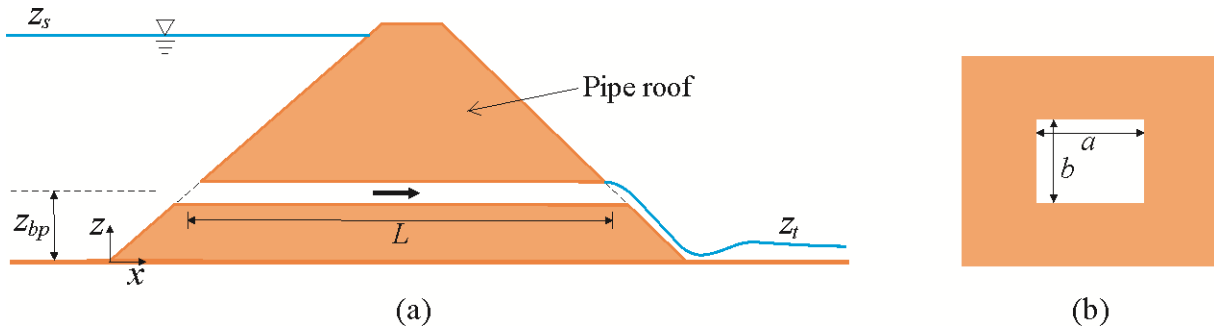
Piping Breach with Variable Definitions: (a) Longitudinal Section; (b) Cross-Section of the Pipe (z_{bp} = elevation of pipe centerline referring to the dam bottom; L = Pipe length; a = pipe width; b = pipe height; z_s = headwater level; z_t = tailwater level)
